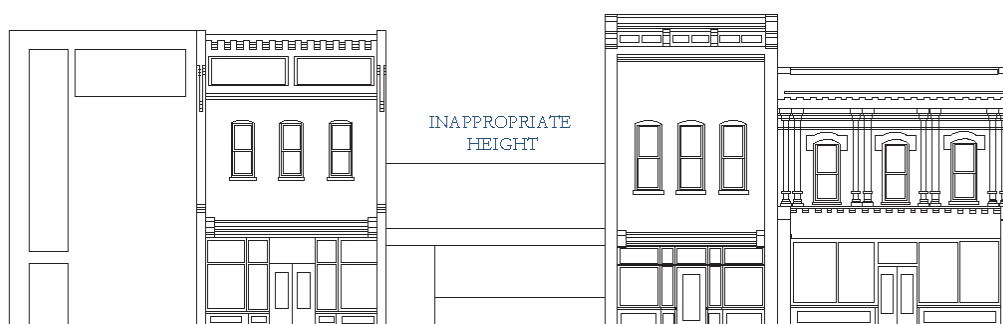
Inappropriate façade arrangement and height of new construction interrupts street rhythm.
